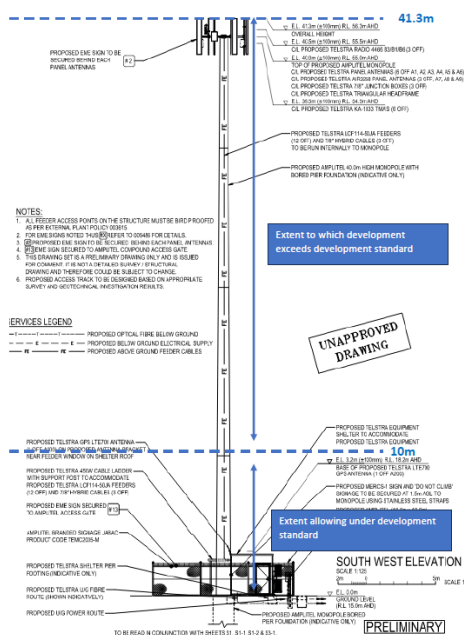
Elevation plan of proposal – Drawn by CPS.
